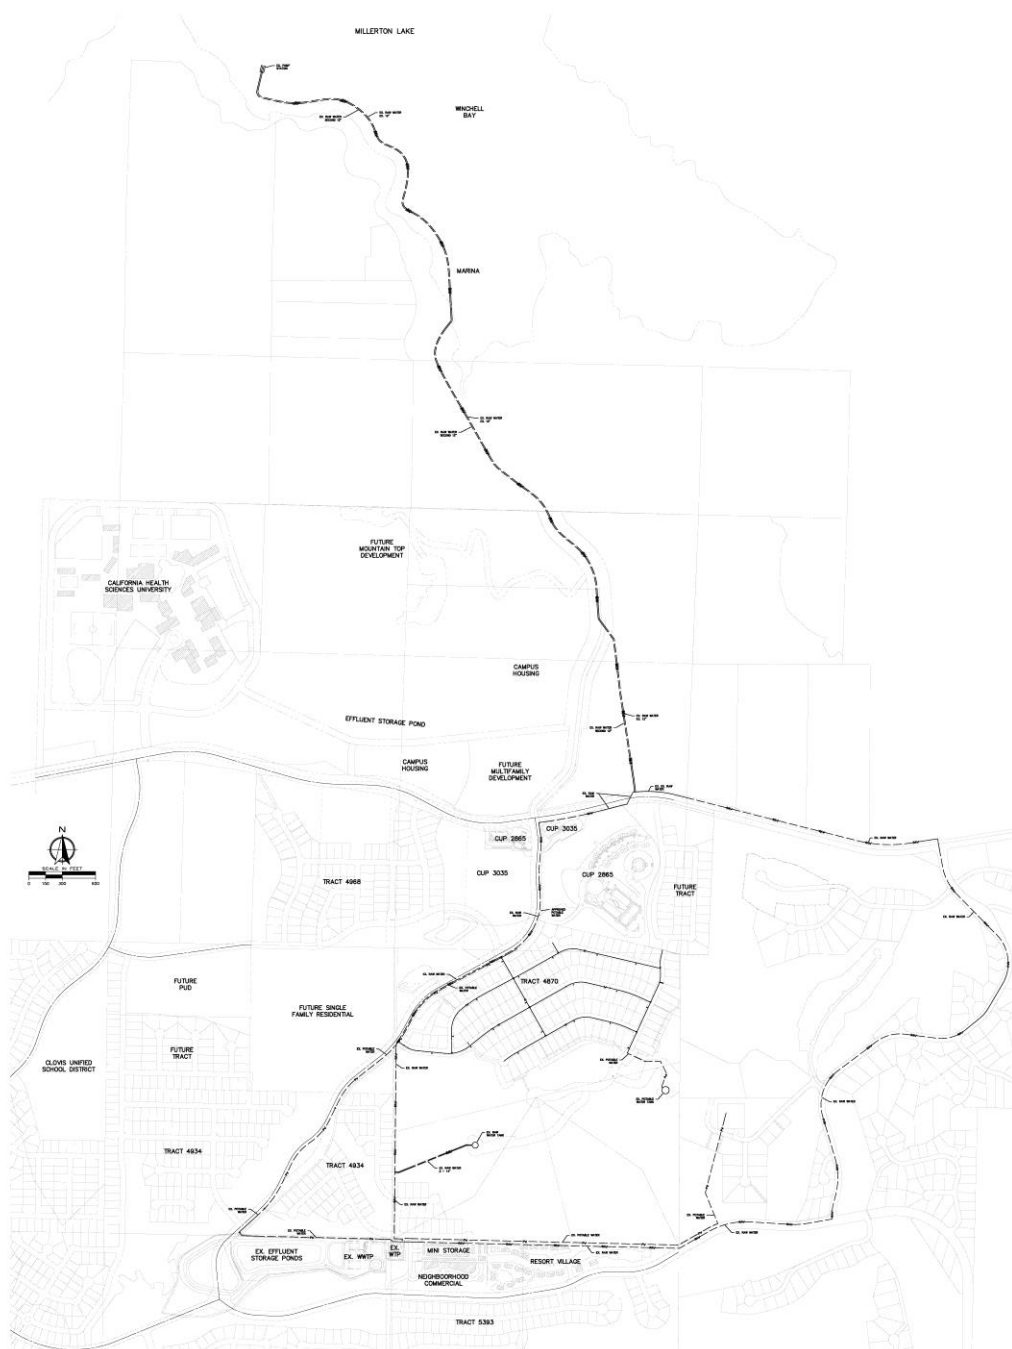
Existing and Proposed Infrastructure within the MNT Specific Plan Area
